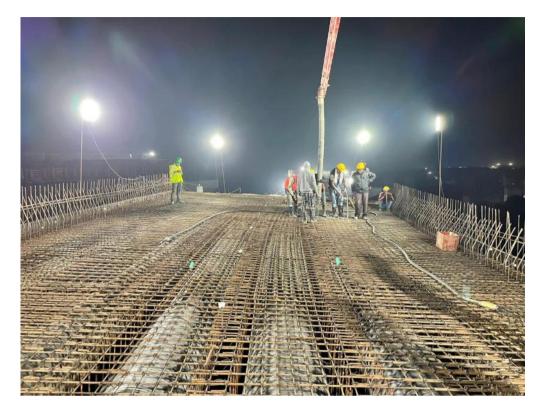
Pier final lift concreting at MP 187 LHS in progress
